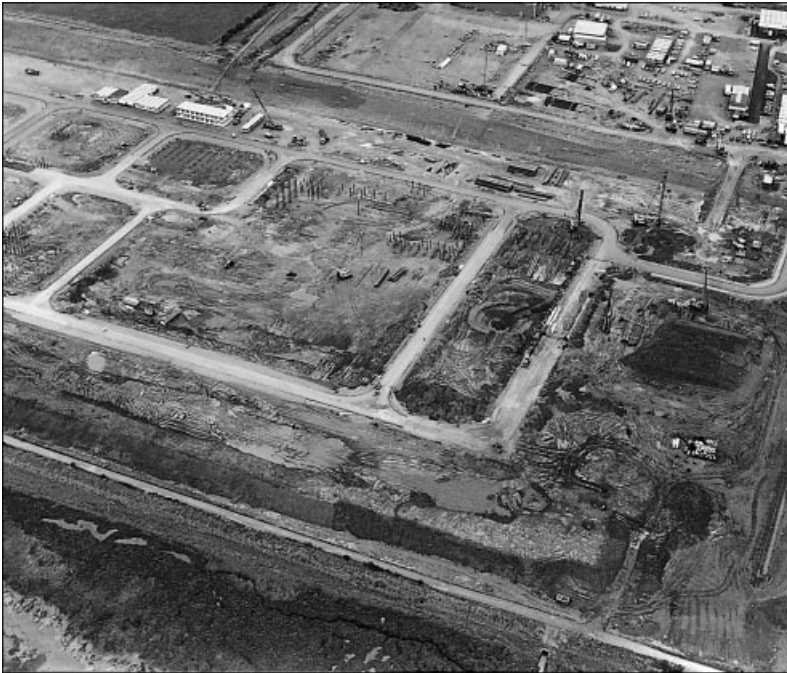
Aerial view of the site from the south-west showing the piling works nearing completion
